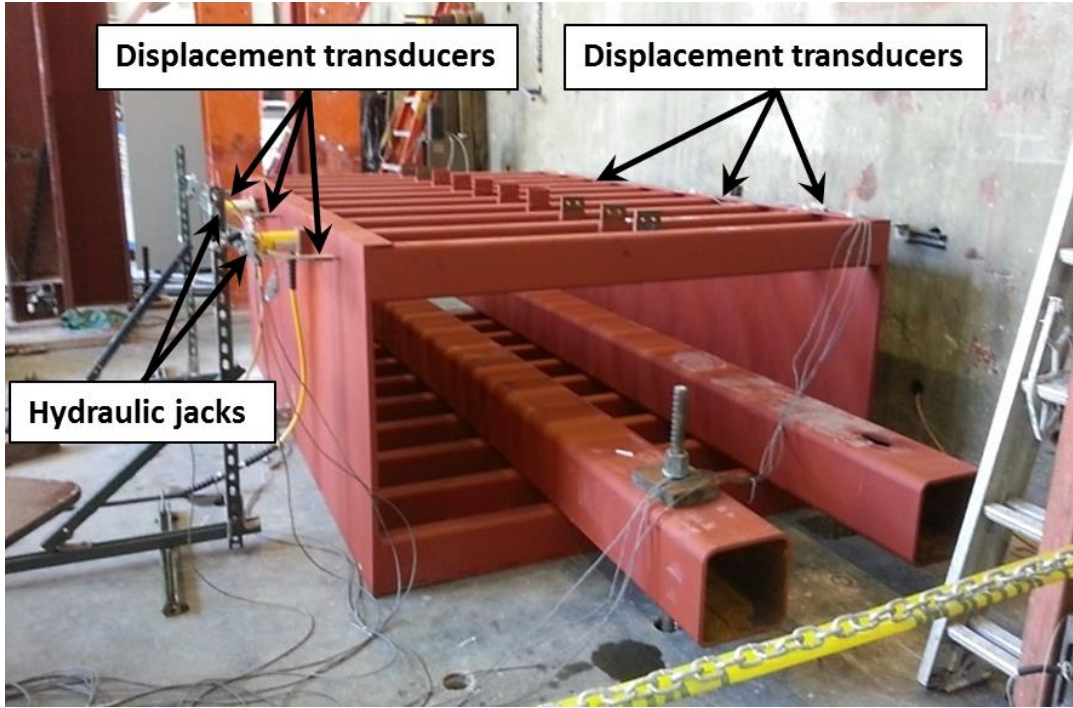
Photographs of test setup to measure lateral stiffness of the 1/9 scale steel tunnel specimen
